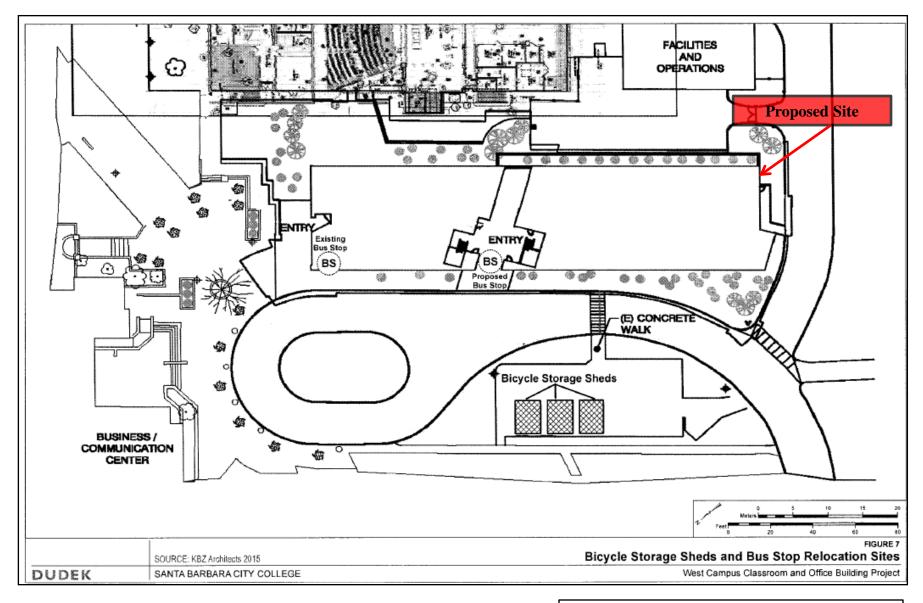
Site Plan for West Campus Classroom/Office Building Complex PWP-4-CSB-14-0005-1 & CSB-NOID-0003-14
